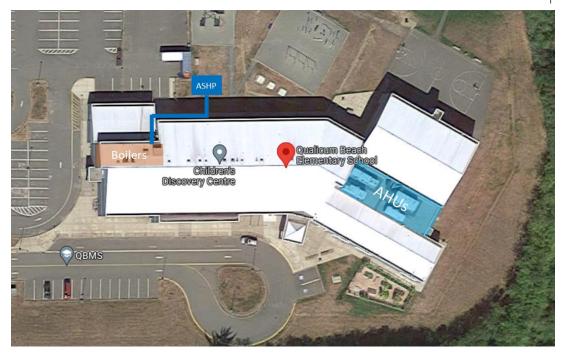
Possible alternative locations for an air-source heat pump connected to the heating loop
